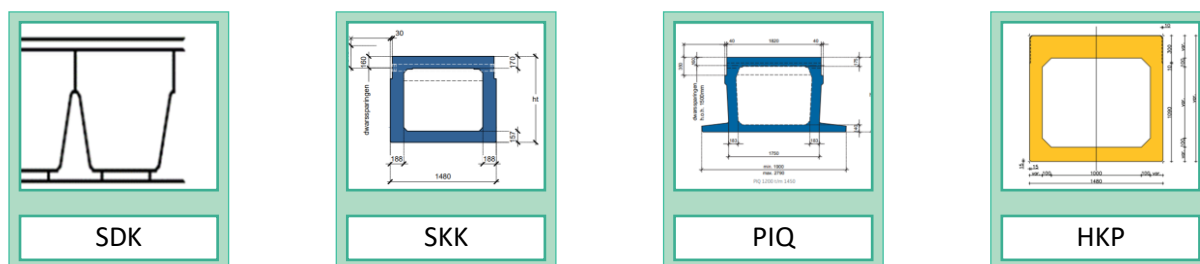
Cross sections of different box girders (Spanbeton, n.d.-d; Haitsma beton, n.d.-c)
